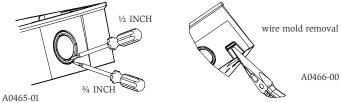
KNOCKOUT REMOVAL FOR SURFACE MOUNT BACK BOX:
